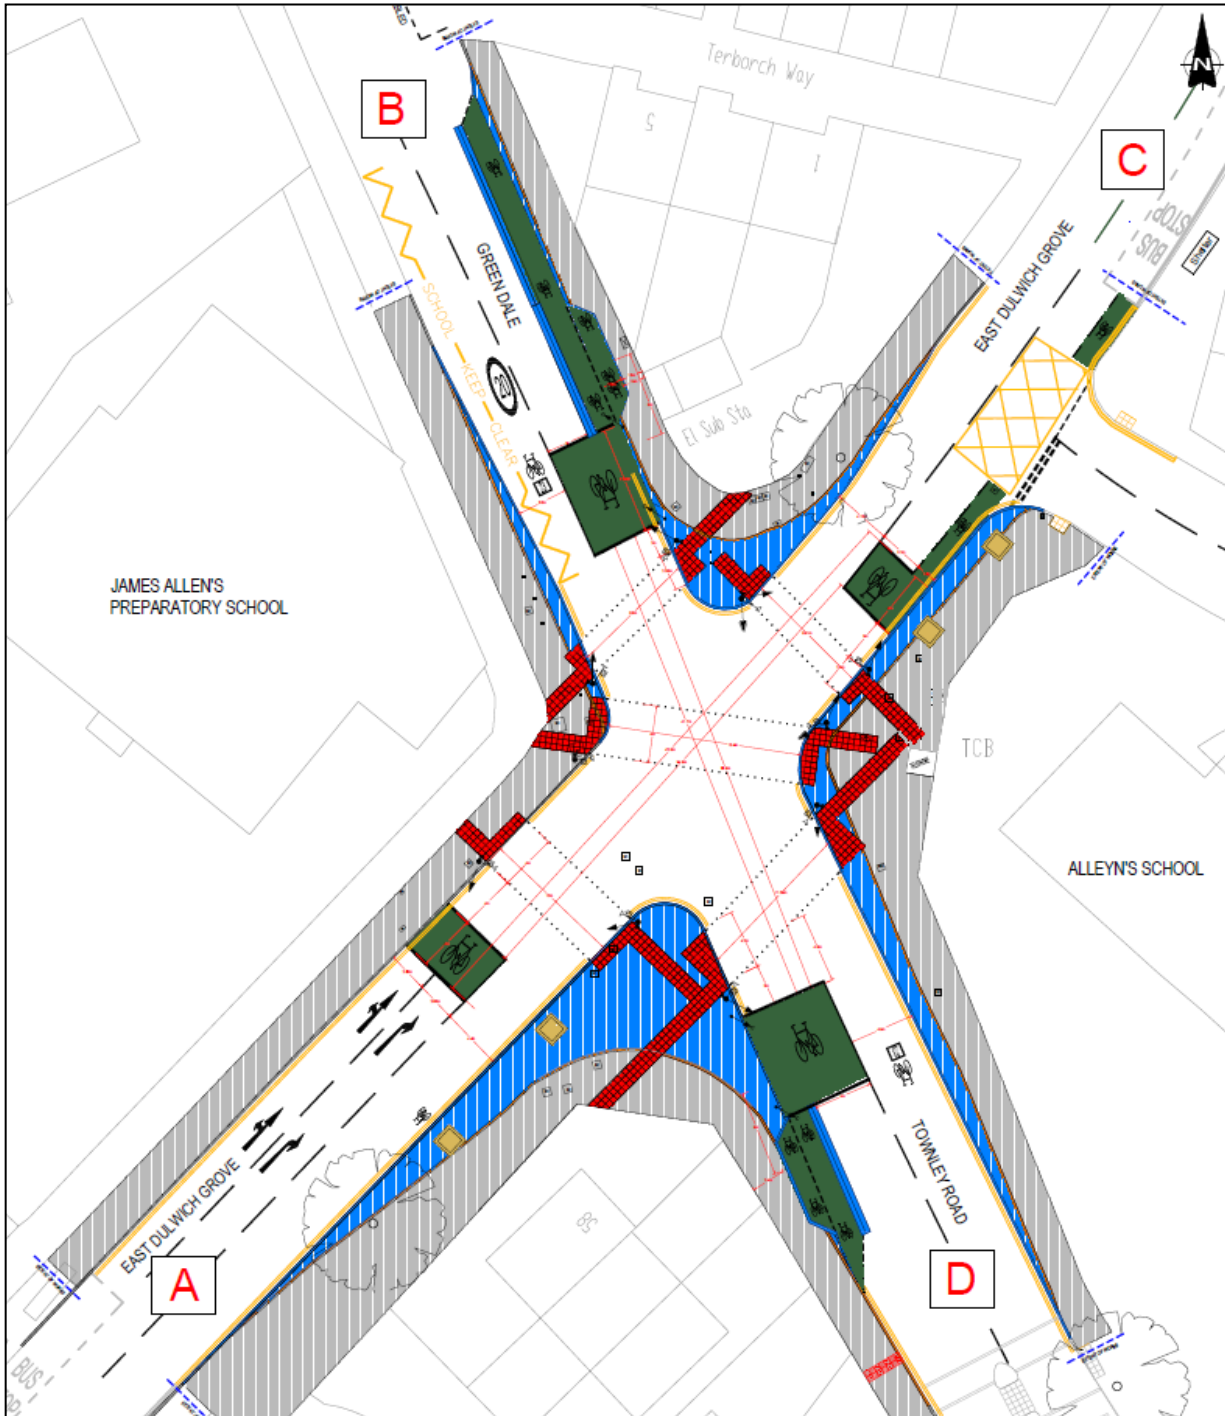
Figure E – Detailed Design Drawing of Option 7 No. D/EDG/CM/13/001/O7
